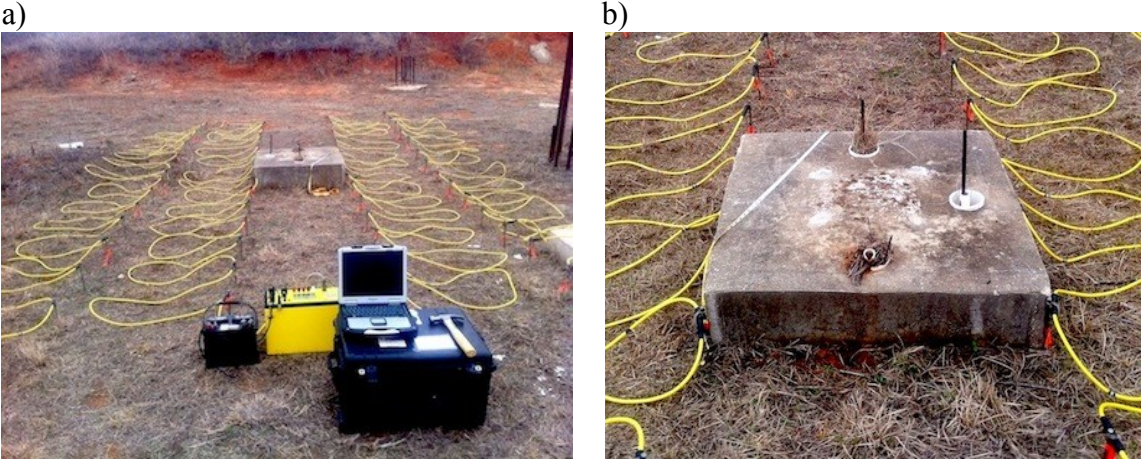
(a) View of 3D layout in a rectangular grid of electrodes over Footing 5 and (b) a close up view of the Footing 5.
